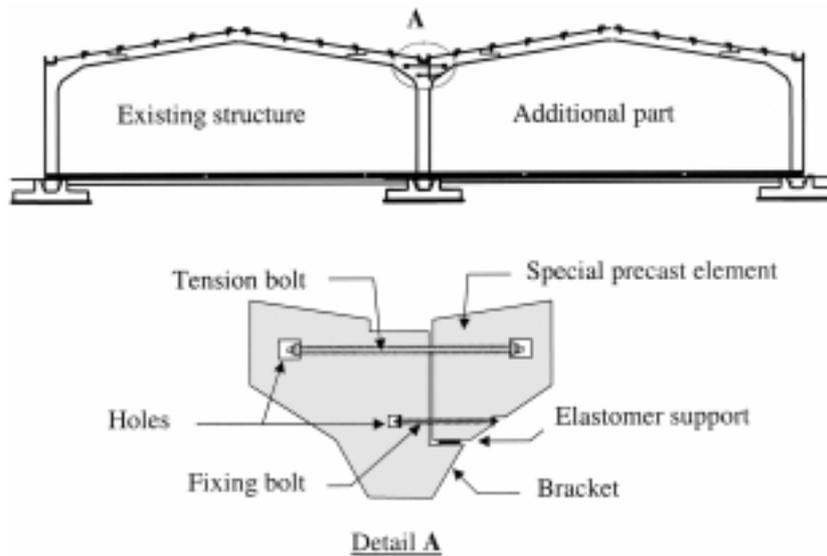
Structure enlarged by a bolted beam connection and Detail A
